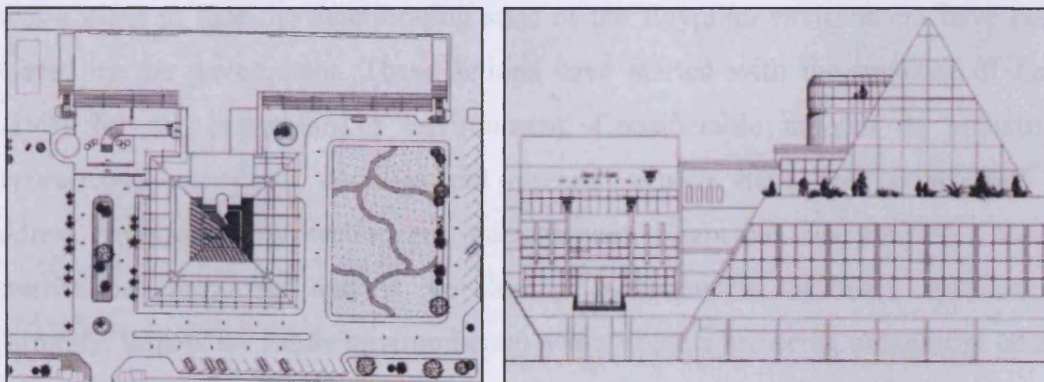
29: Site plan and elevation showing the relation between the hospital masses.
